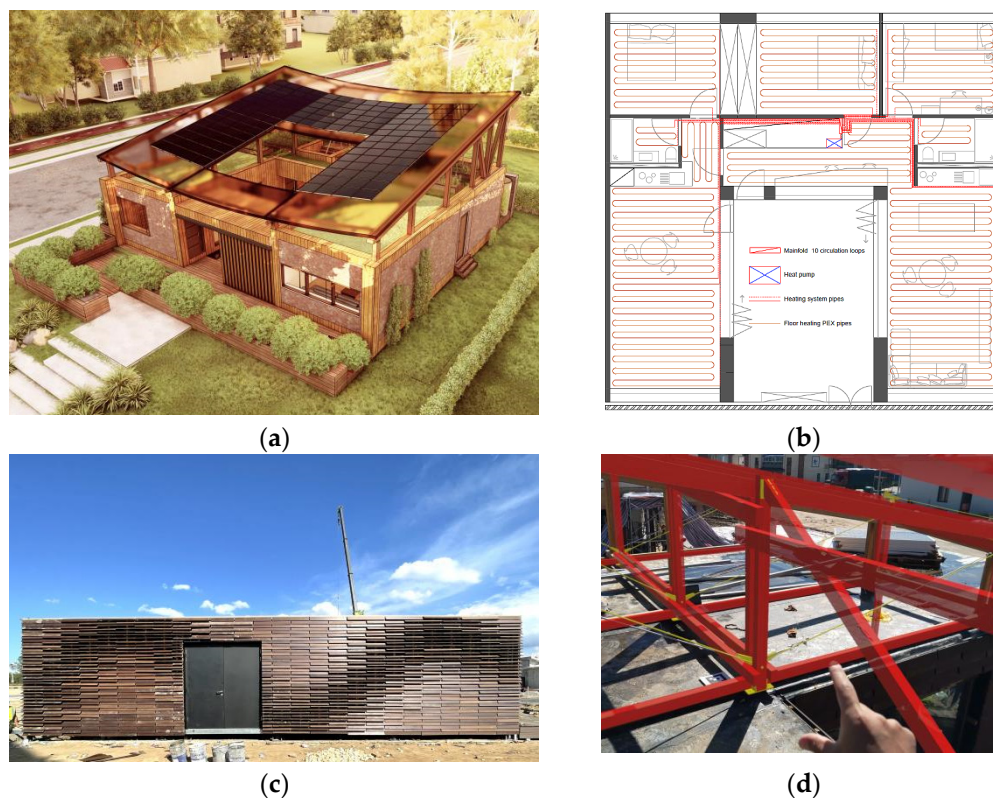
Main results of the Aurora. (a) Solar roof. (b) Underfloor heating/cooling. (c) Bamboo brick wall. (d) MR for construction.
